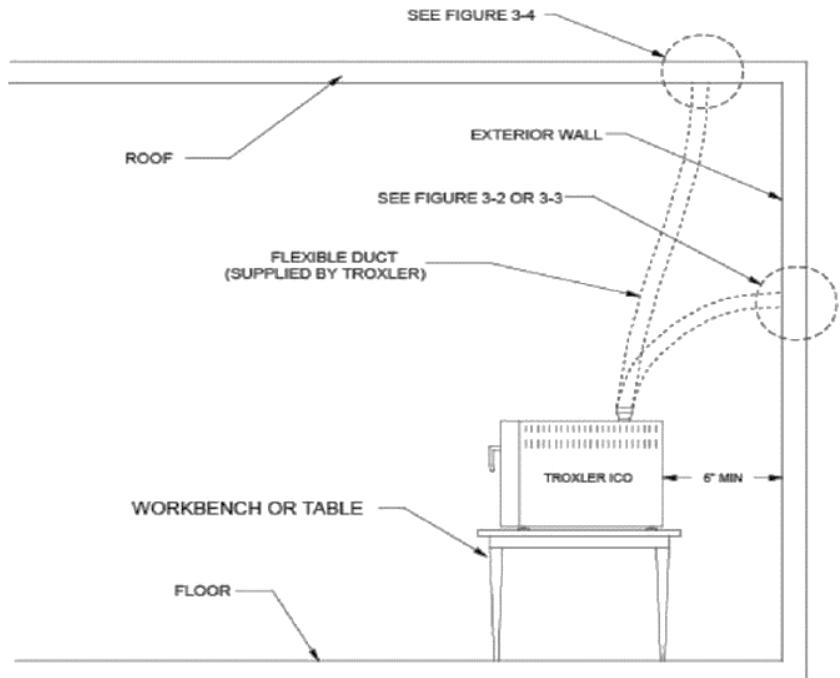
Overall Schematic for Exterior Wall and Roof Penetrations
